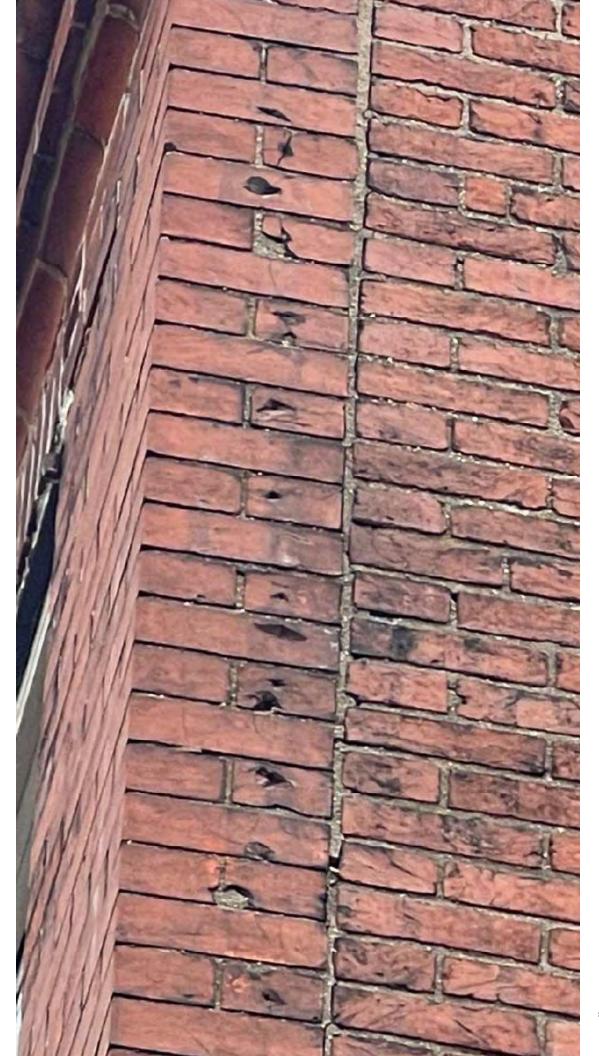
Again, shows the north facing elevation pf 504 S Juniper. Note extensive deterioration of bricks, spalling, cracks, and missing segments/holes present in many of the bricks. Many of these defects are filled with cement.
